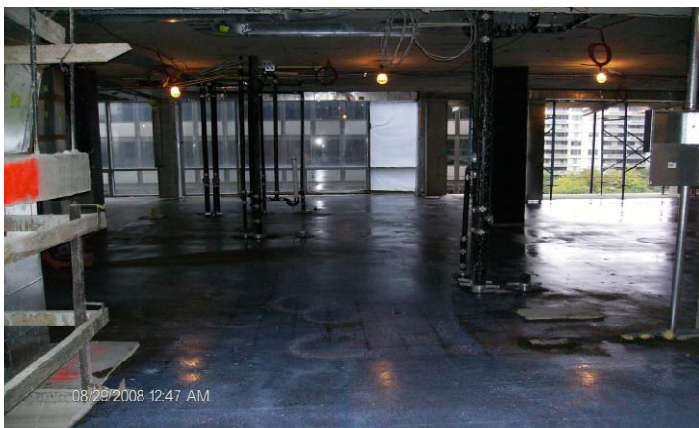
Slab leveling complete after installation of risers creating constructability issues
